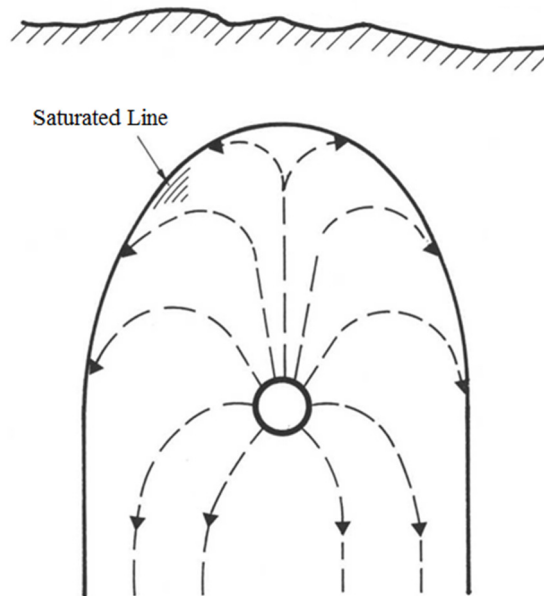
Saturated Zone around a Pervious Tunnel (Schleiss, 1997)
